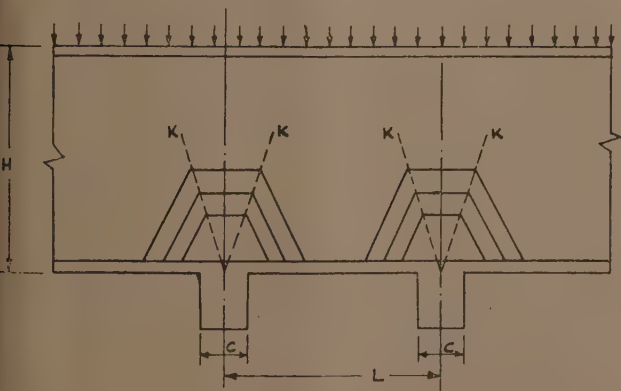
Reinforcement scheme for continuous girder wall under uniformly distributed loading along the upper edge
